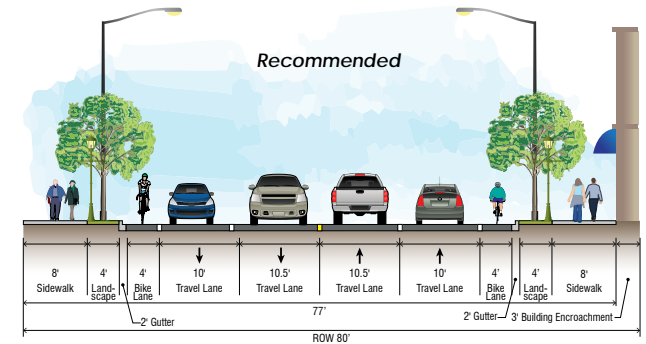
Rio Grande Boulevard (Mountain Road to Hollywood Avenue) Cross Section
